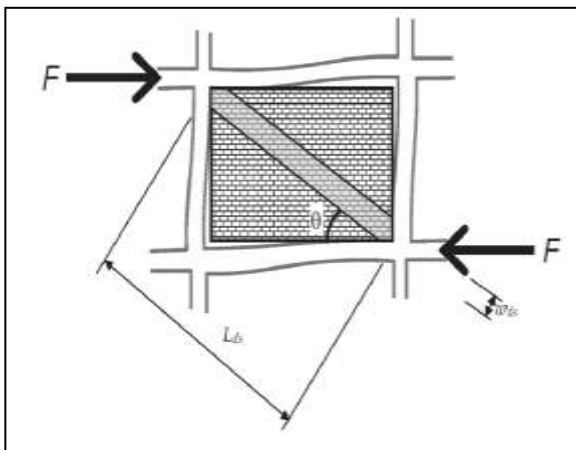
modelling of masonry infill wall as equivalent diagonal strut of URM infill wall
